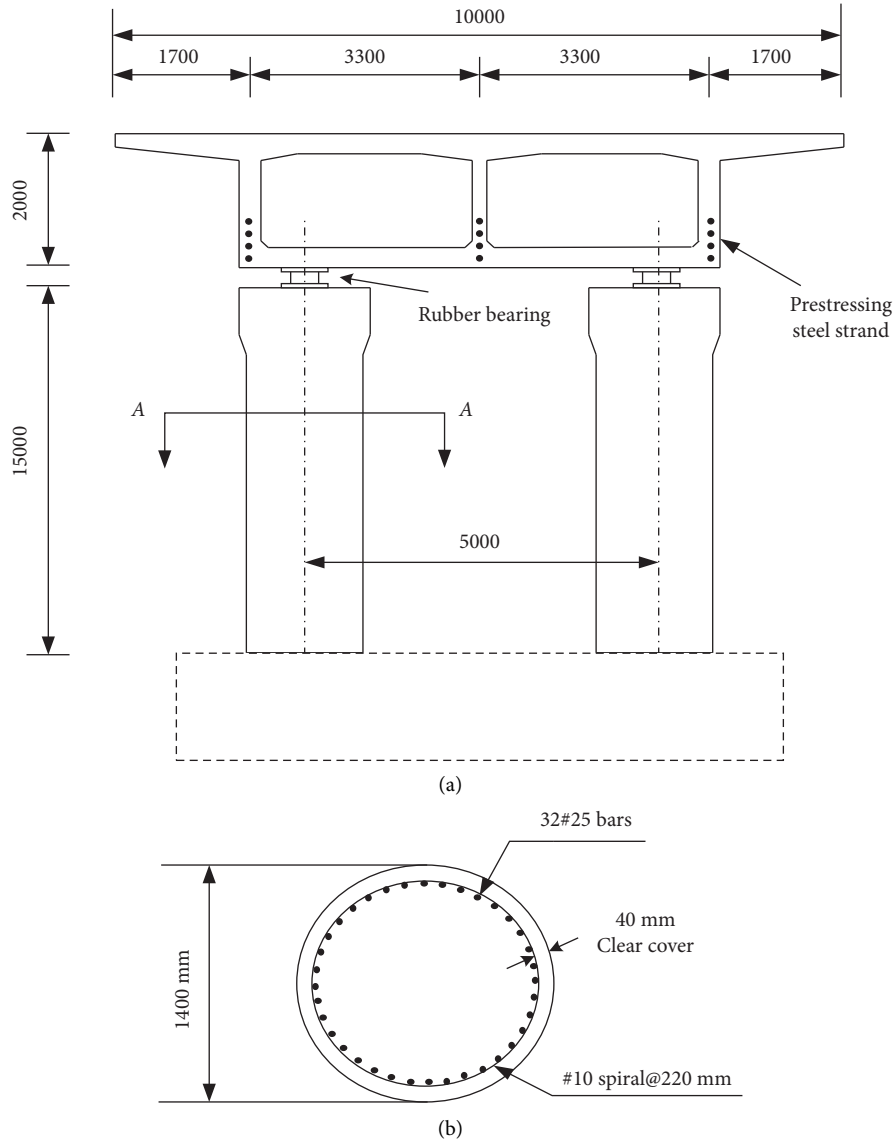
Bridge dimension diagram. (a) Cross-section; (b) pier section.
